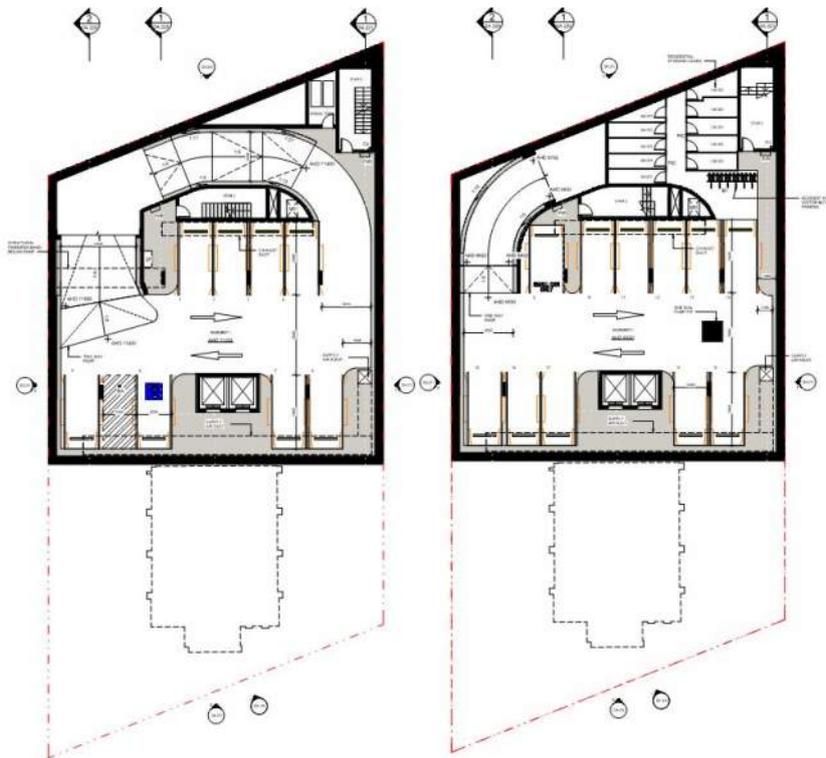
Basement 2 Plan (left), and Basement 1 Plan (right), with the church foundations outlined.
